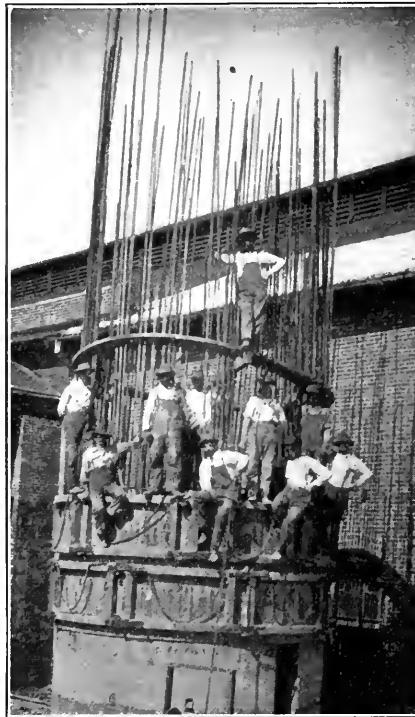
METHOD OF REINFORCING CONCRETE STACK
